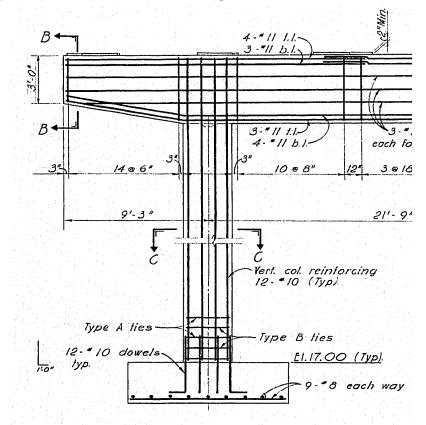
Interior Bents Connections - Bents Columns to spread footing, inadequate reinforcing embedment
